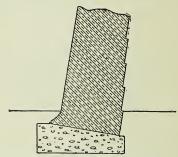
Retaining Wall Foundation on Compact Sand and Gravel.
